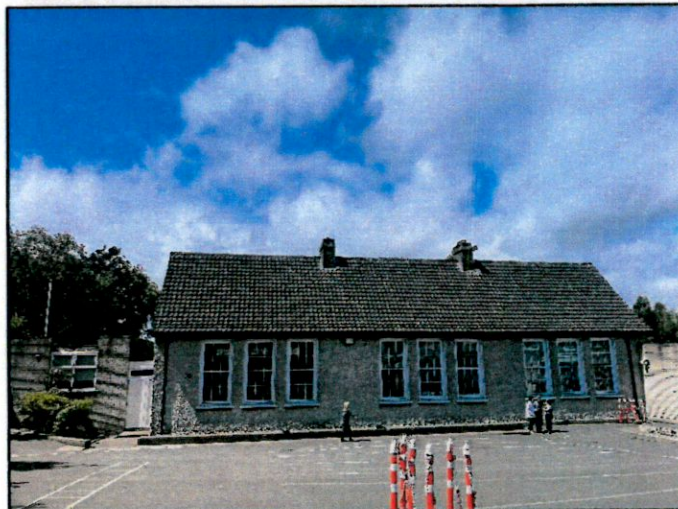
Building to be demolish to the left and building where works were ongoing directly adjacent to this. Only the leftmost section of this building had ongoing works.
